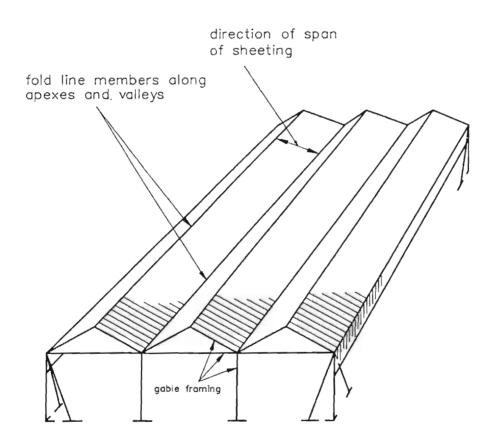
General arrangement of a typical light gauge steel folded plate roof.
